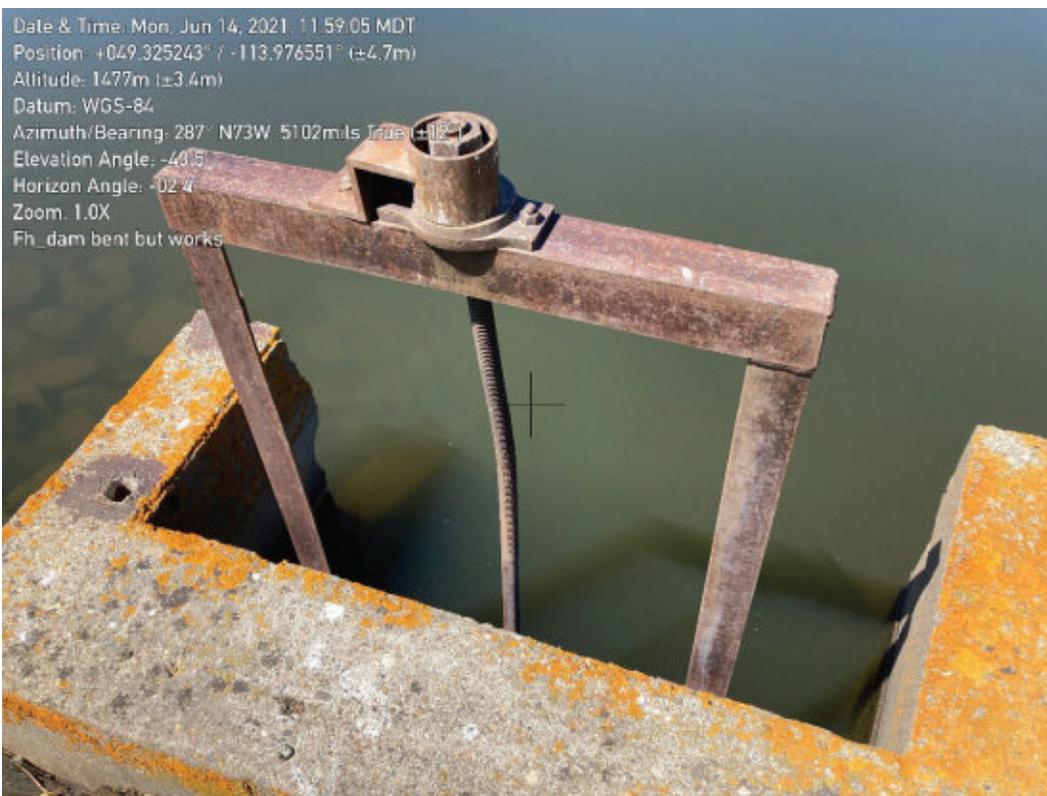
Damaged CSP outlet culvert pipe head and headworks of low level outlet
